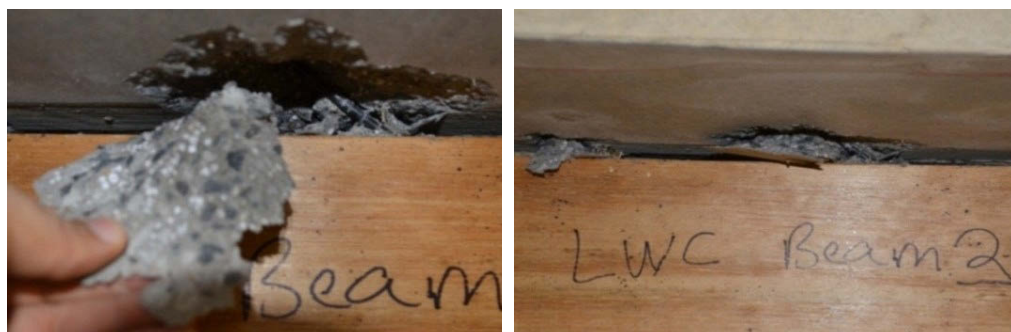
Localised failure of concrete at shear connectors in TCC LWC2 module
